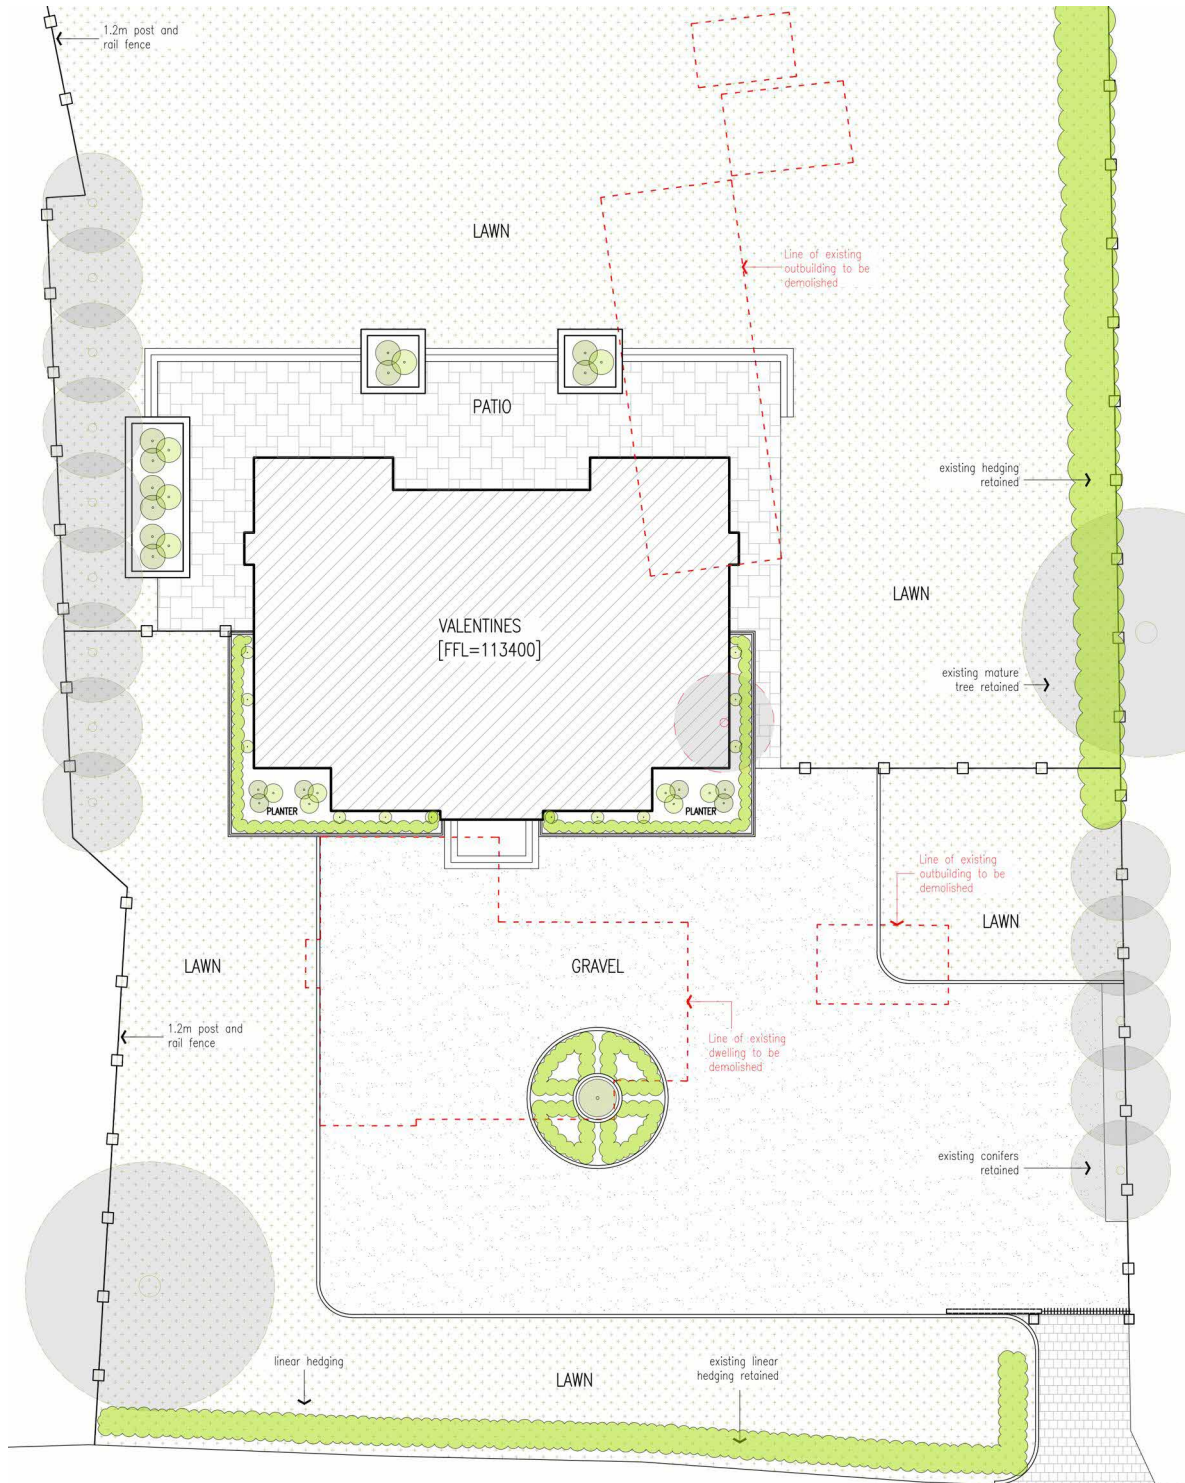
The proposed site plan (extract from drawing 340_PL08)
